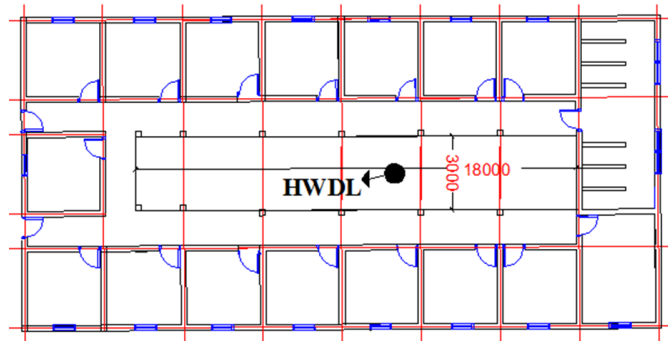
Floor Plan of the Fully Enclosed Courtyard House
